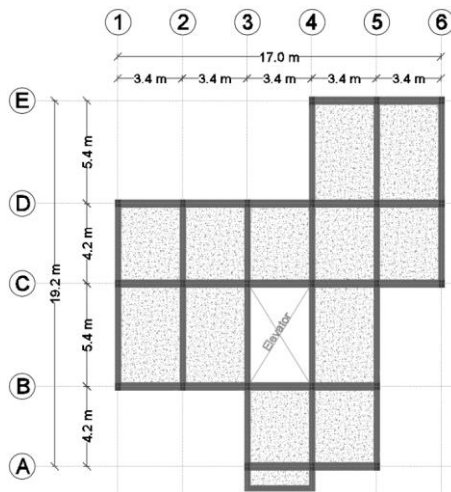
The plan view of the Template Design 4 (TD_4) building
